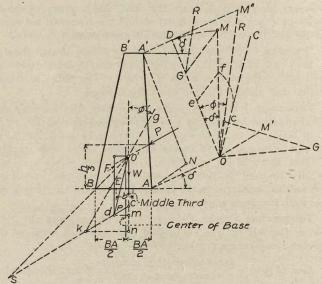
Diagram of Forces for Masonry Retaining Wall.
